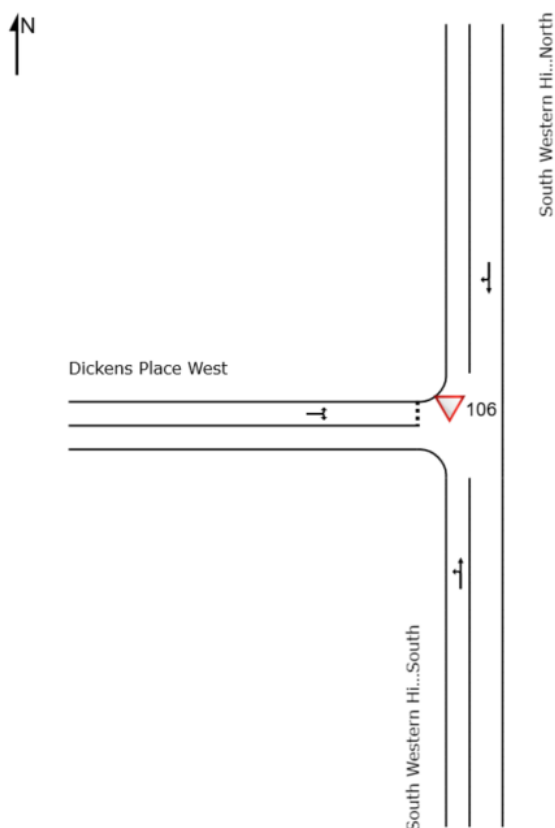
SWH/ Dickens PI – Existing intersection layout
